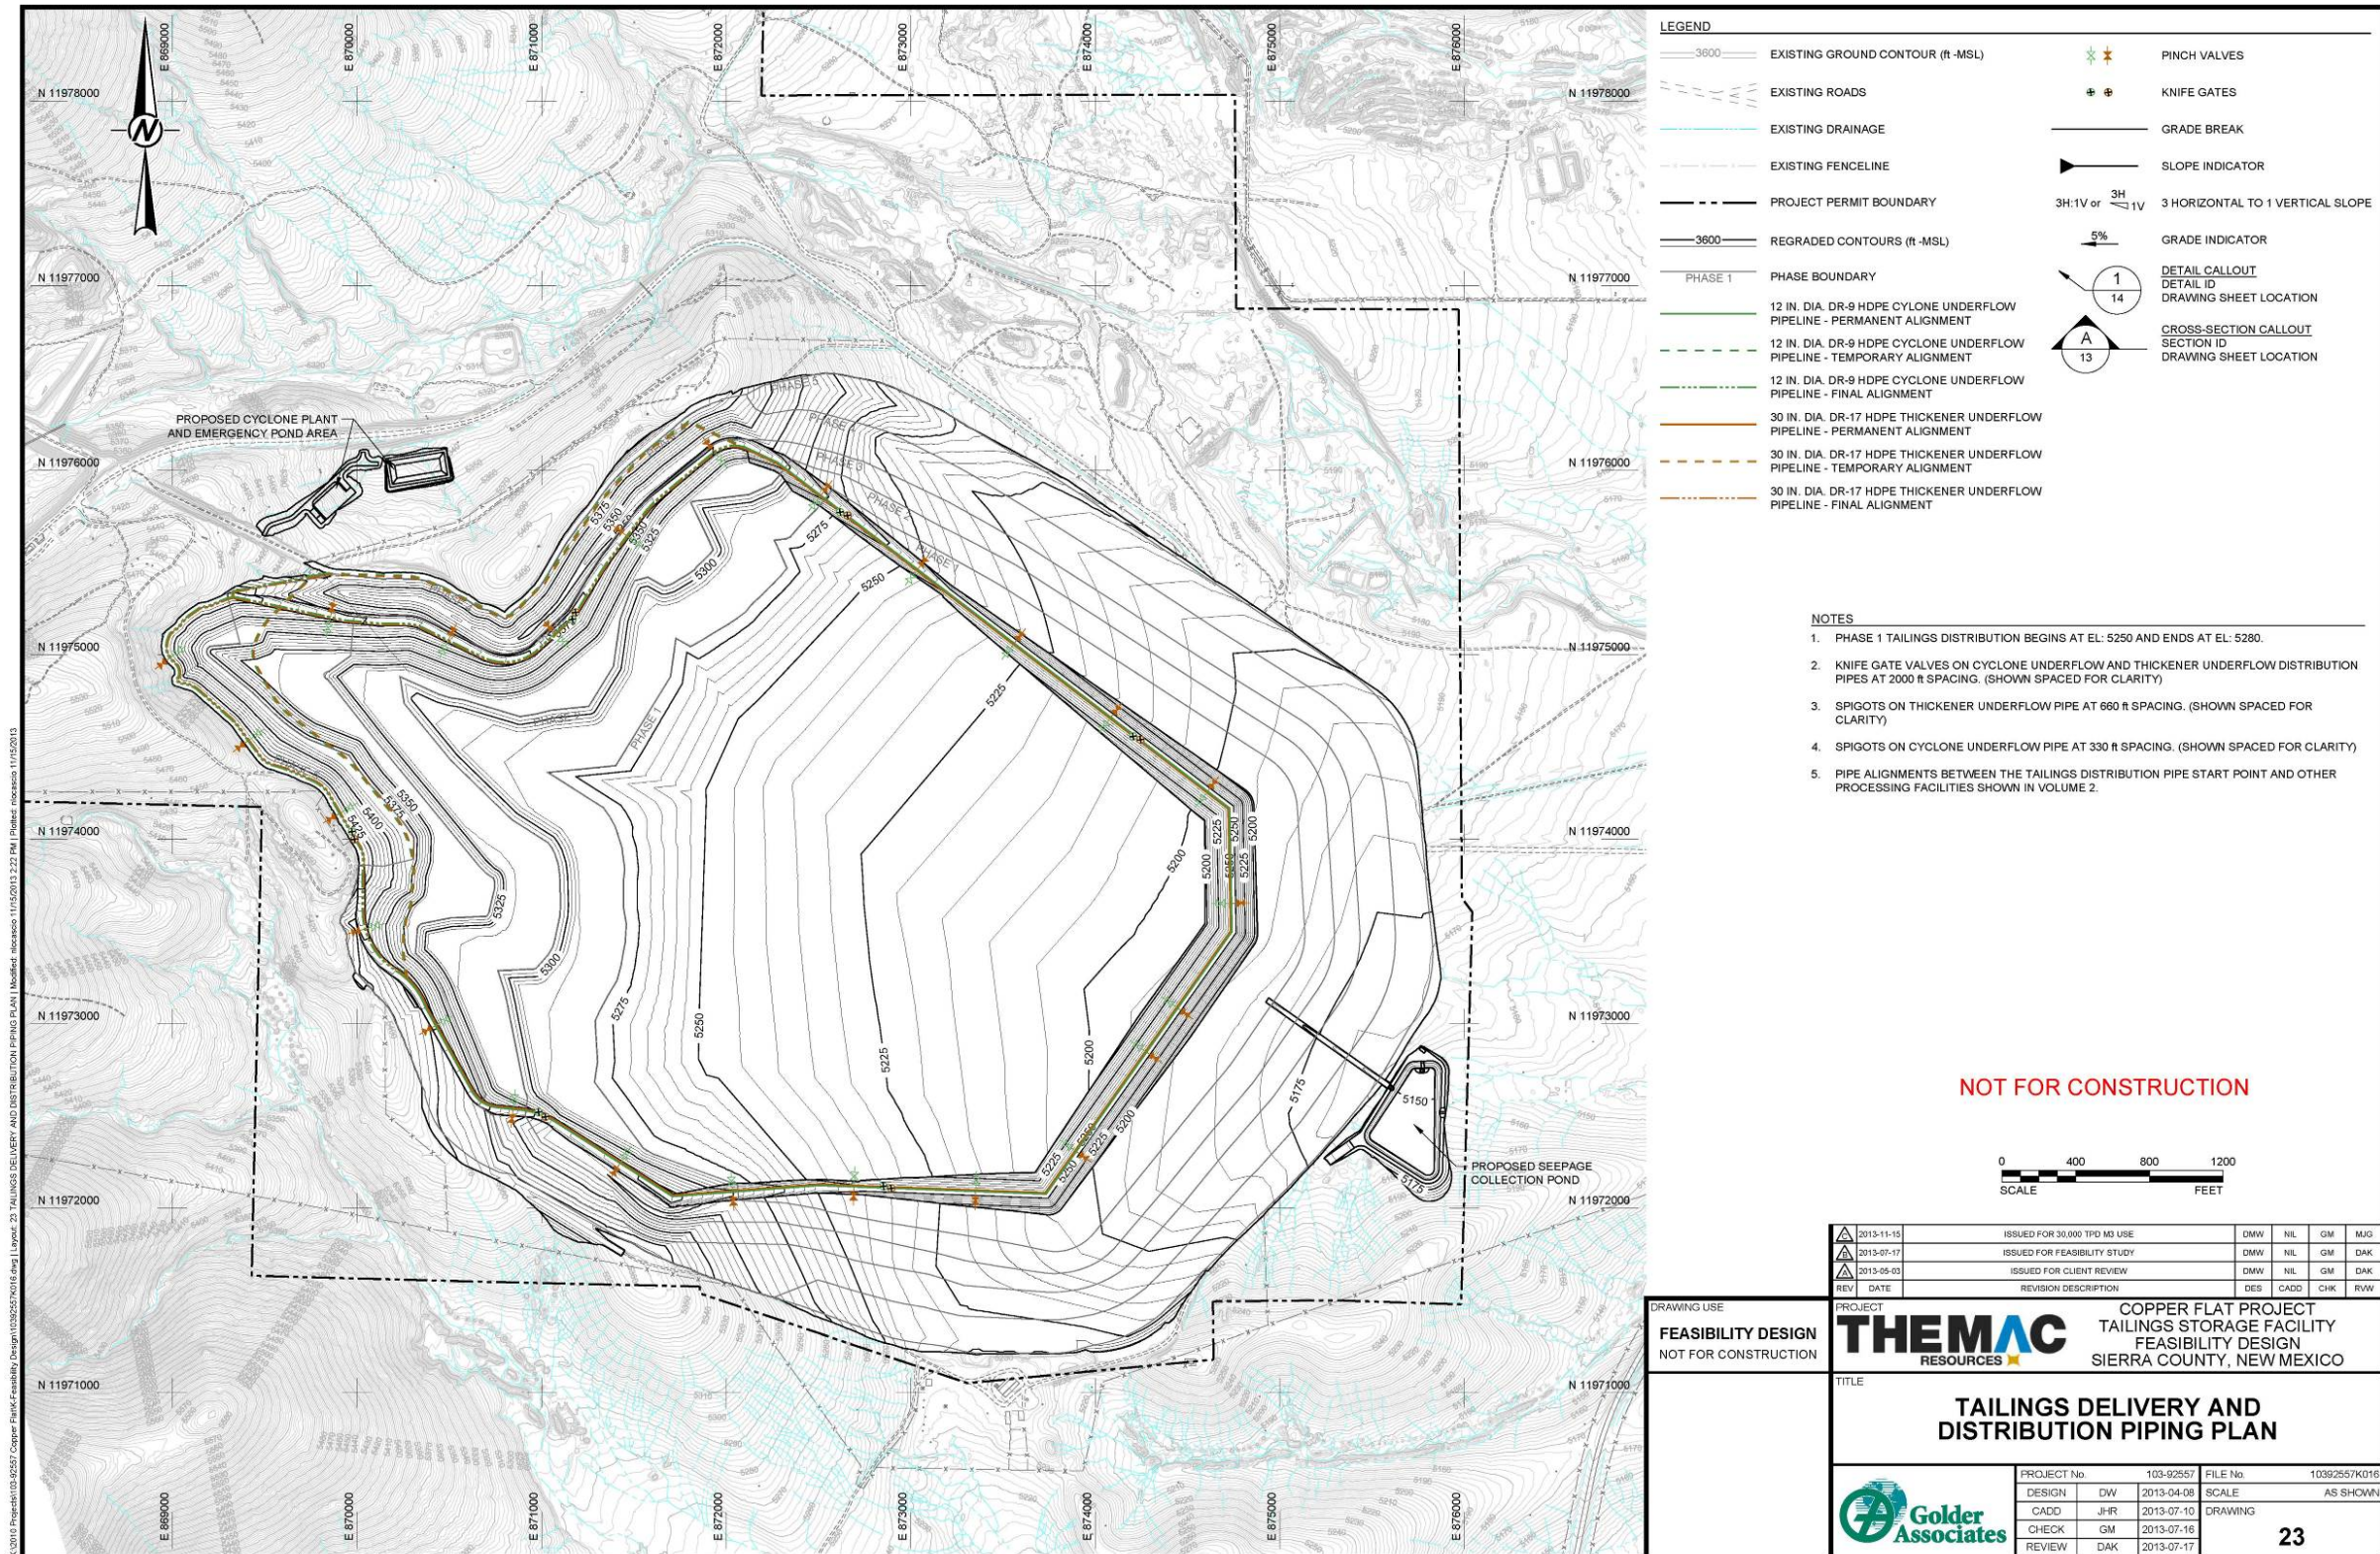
Tailings Delivery and Distribution Piping Plan
